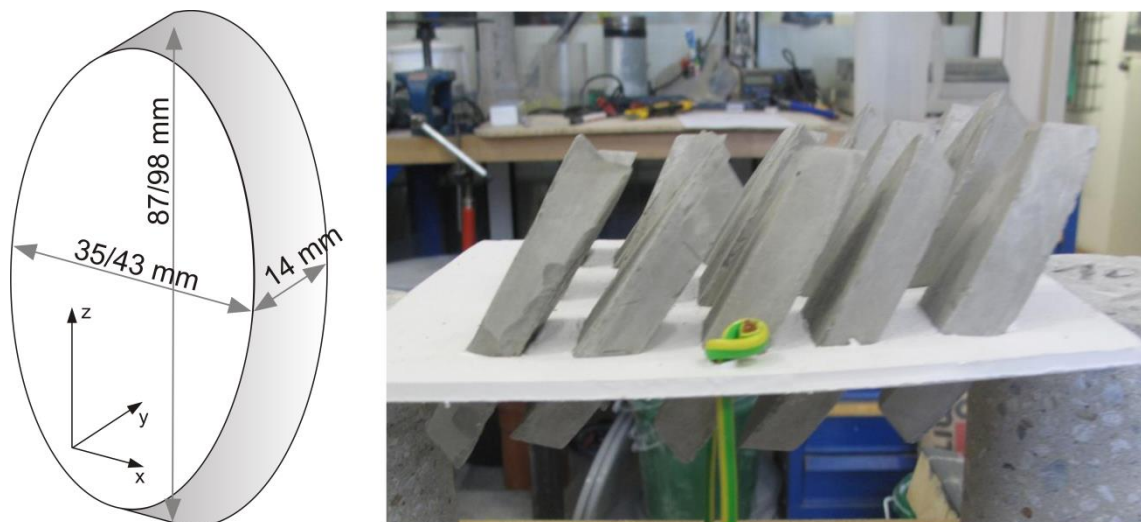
Sketch of block with dimensions (left) and fabricated blocks after stripping (right).
